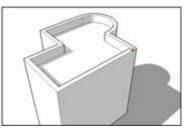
Modeling parapets on flat-roofed buildings is easy.
